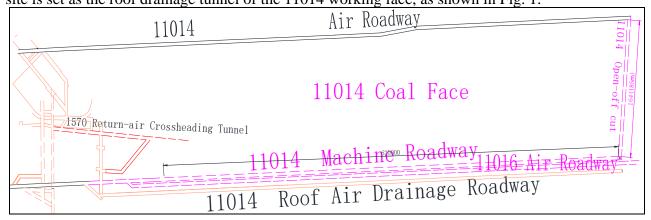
Schematic diagram of hydraulic fracturing in the roof of the working face 11014
